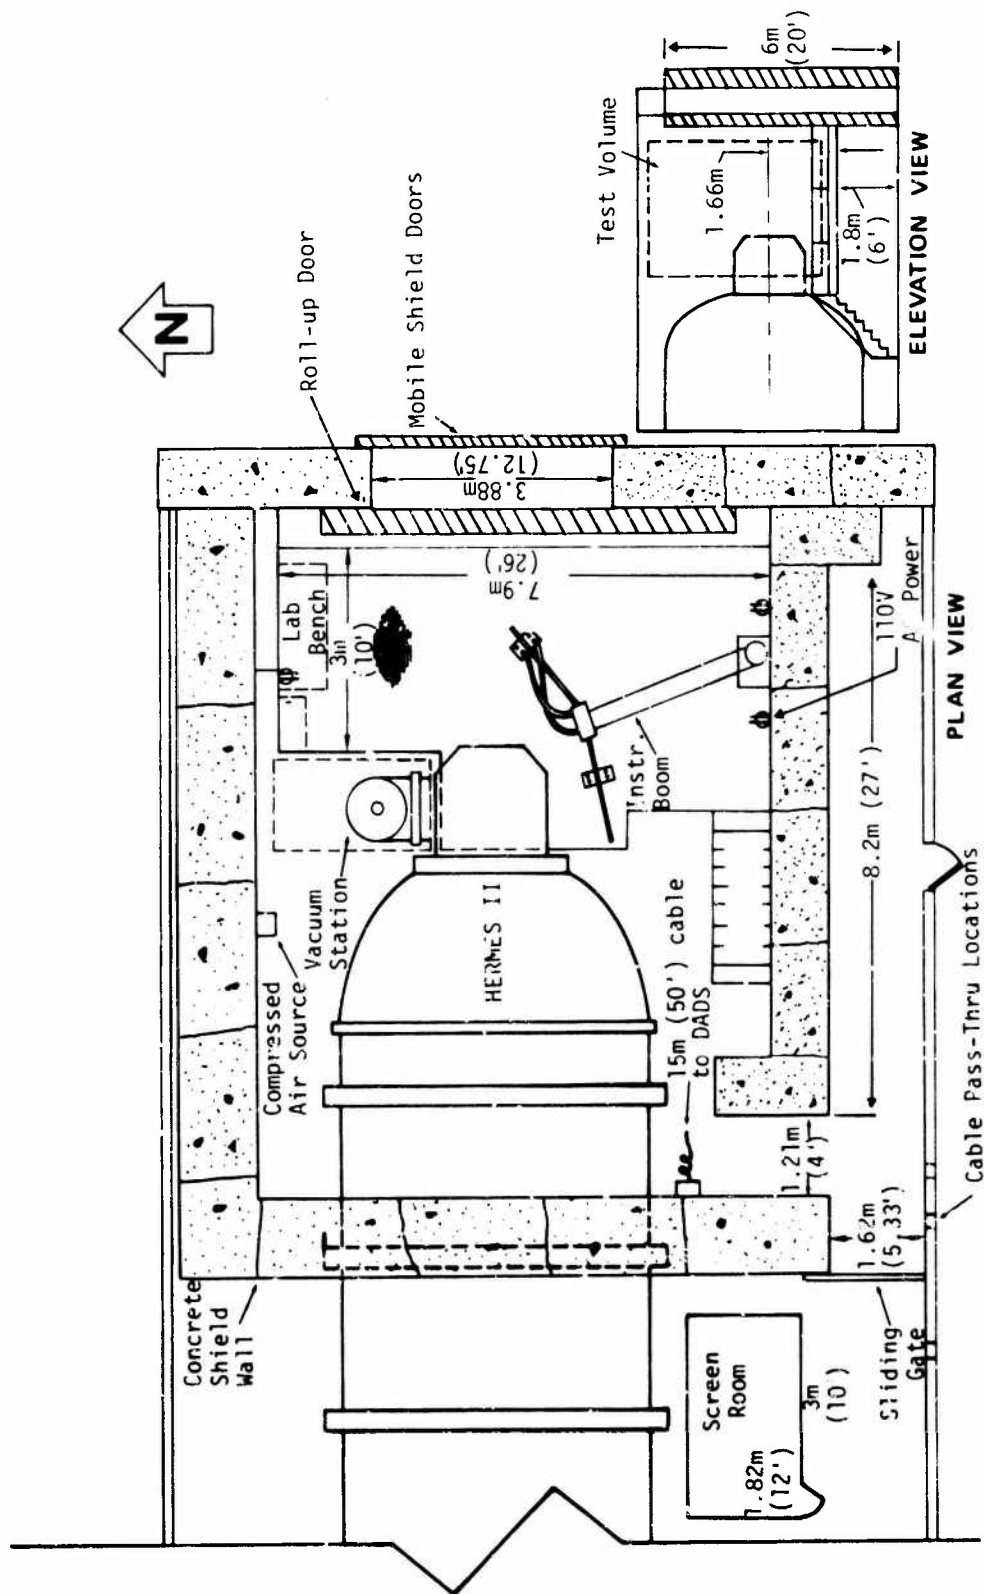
Detail plan view of HERMES II test cell and inset showing an elevation view.
